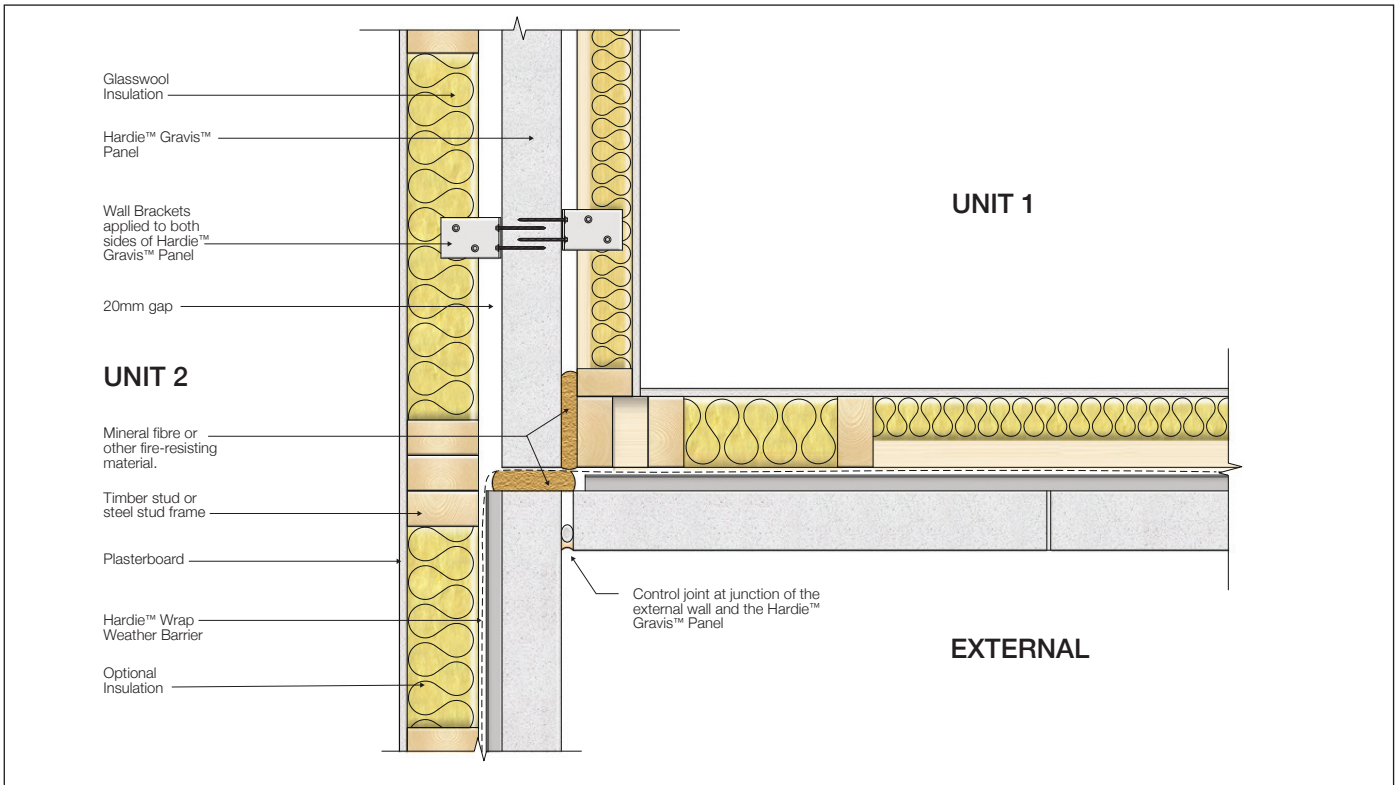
EXTERNAL WALL CORNER FOR VERTICALLY ALIGNED INTERTENANCY DISCONTINUOUS WALL SYSTEM
